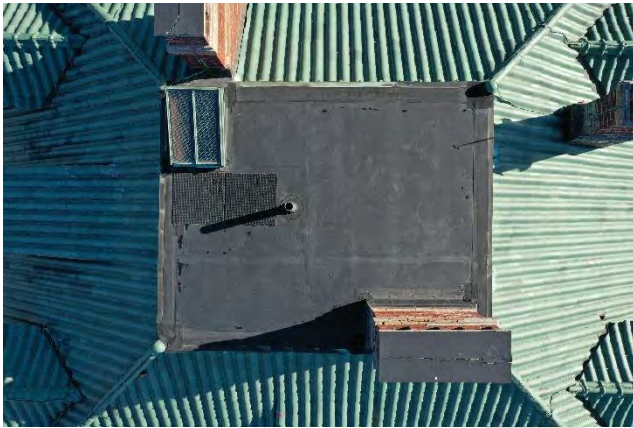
View of upper peak roof, surrounded by the terra cotta Spanish tile roofing, that is covered with elastomeric roofing.
